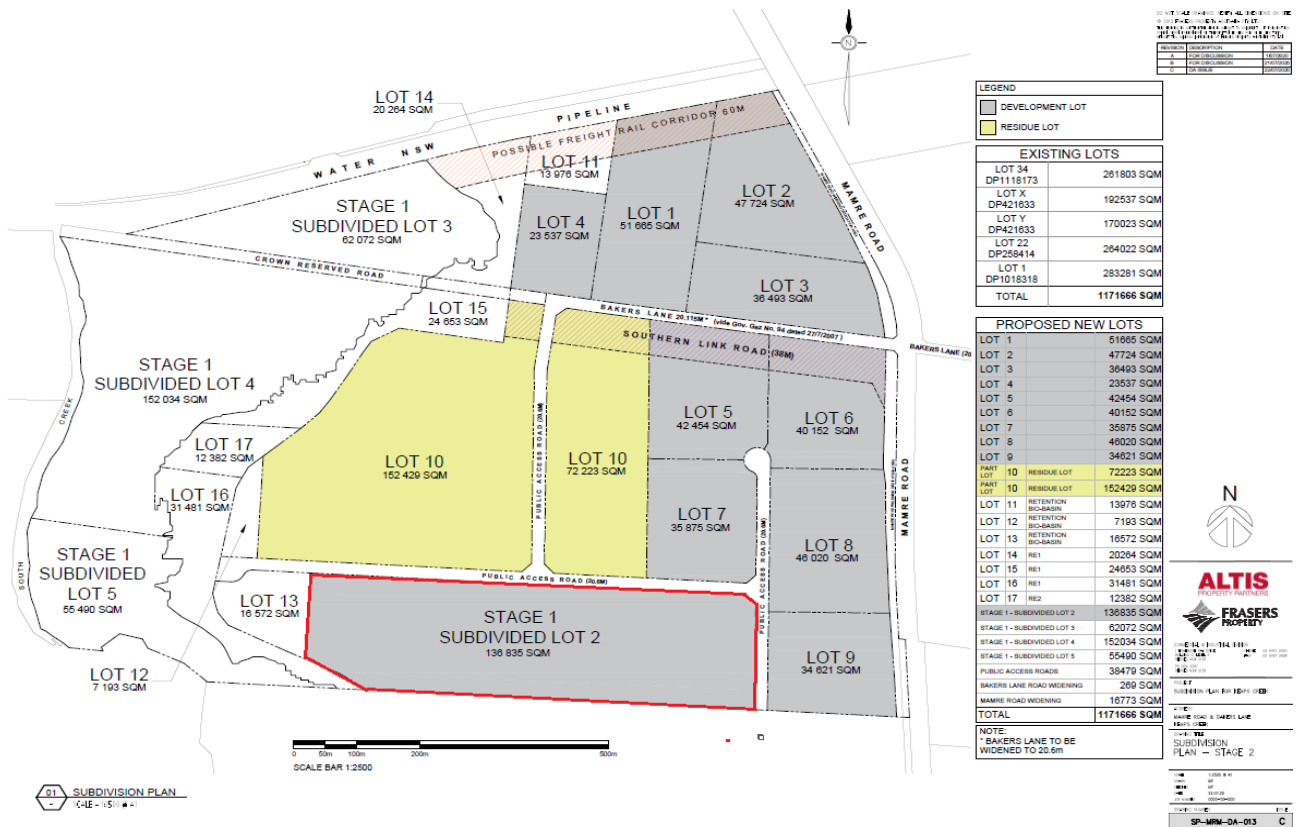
Estate Subdivision Plan - Subject Site outlined in red (Source: Altis/Frasers, 2020)
